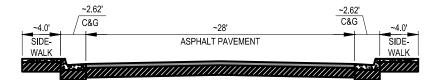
EXISTING AZTEC ROAD TYPICAL SECTION
